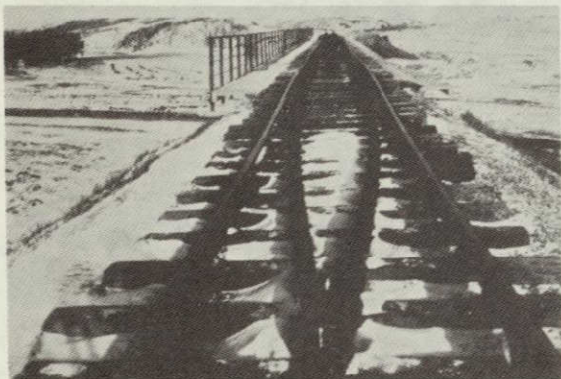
Rails on Chiaochapao Bridge were twisted. (Magnitude unspecified)
